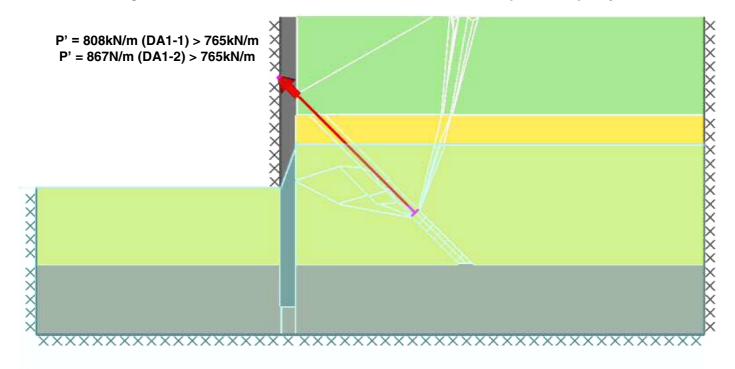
DC3a Pull-out failure - Inclined anchor pull-out capacity for 9m length
